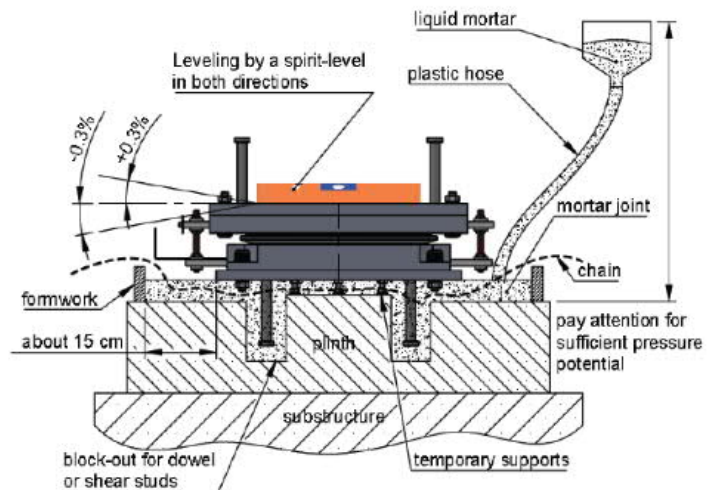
Preparation of the mortar joint to the concrete substructure (schematic)
